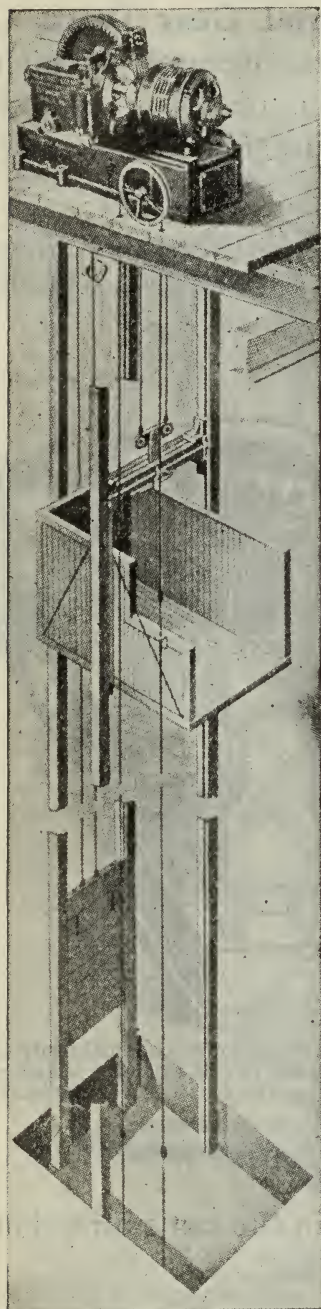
,195.—Albro-Clem internal gear worm drive freight elevator.
